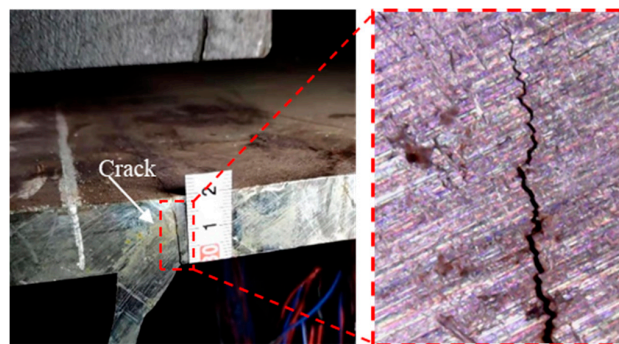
Typical fatigue cracking pattern of tested specimens.
